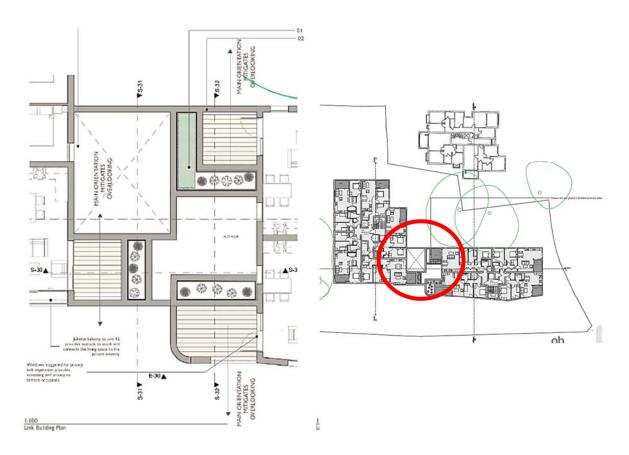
Relationship between units 12, 14 and 17 (left) and proposed first floor plan (right)
